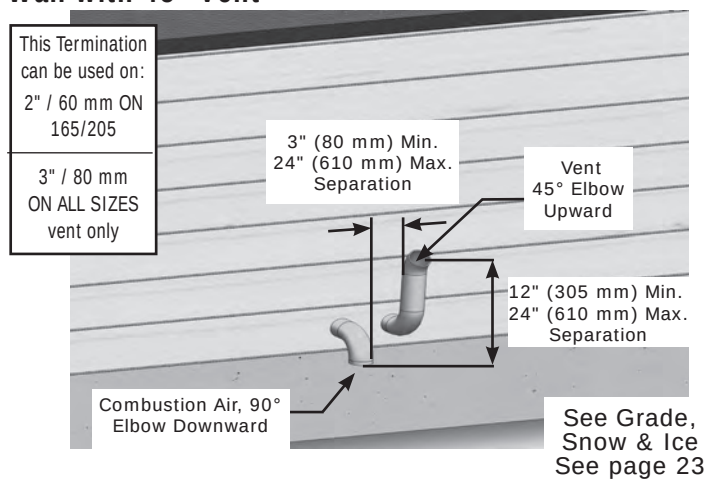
(3" / 80 mm ONLY) Twin Pipe Side Wall Vent
